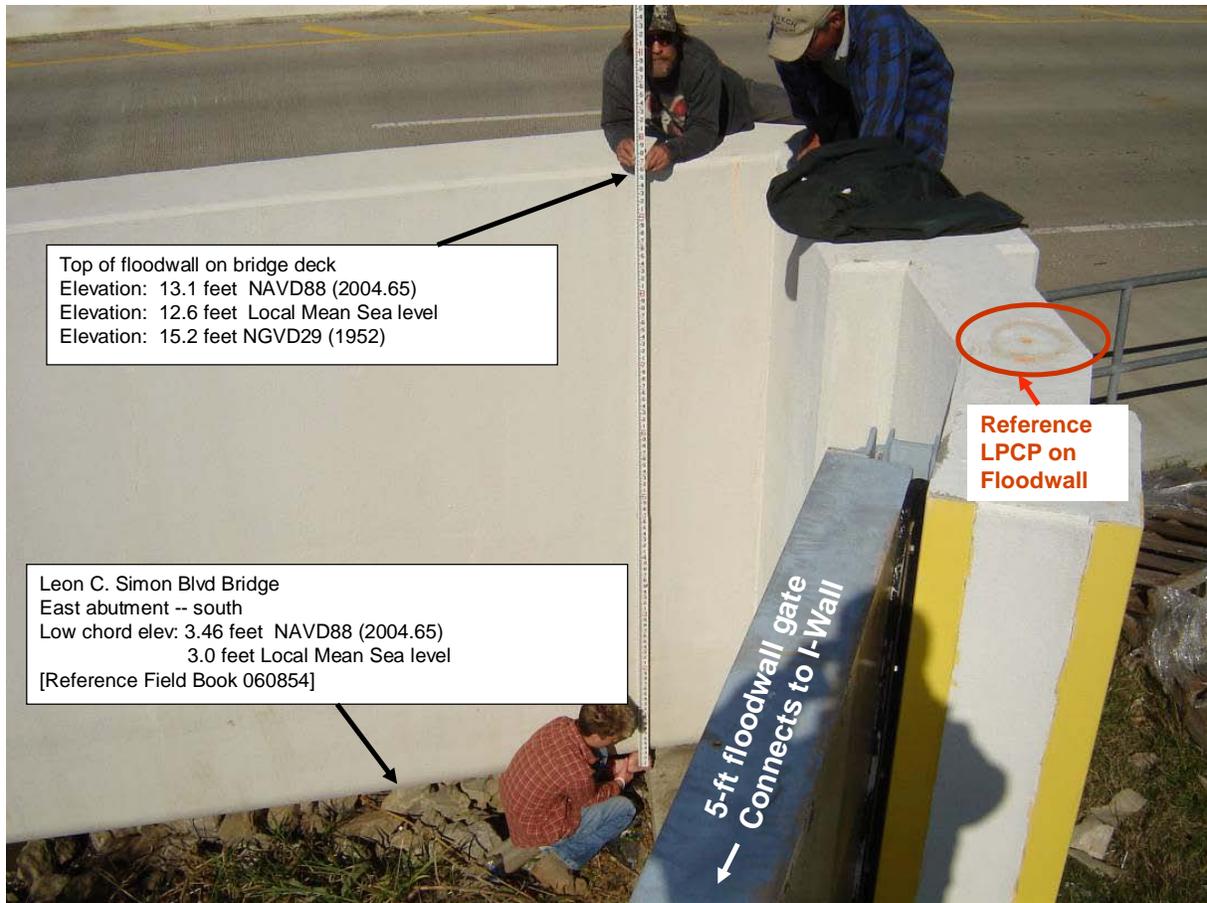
Surveying elevations of bridge chords, flood gates, and floodwalls.
